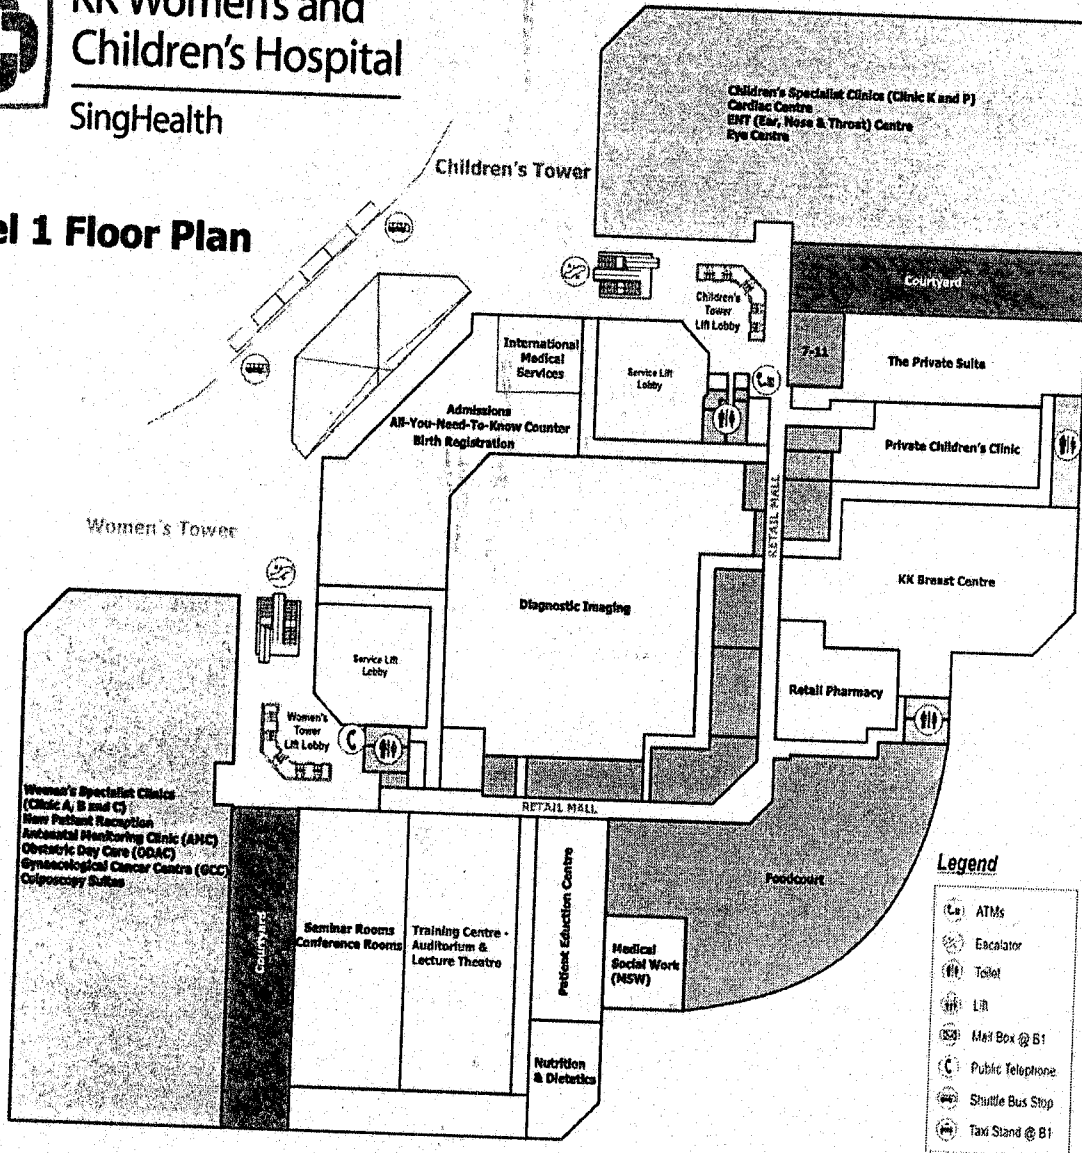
ground floor plan of the k k women's and children's hospital, Singapore.
